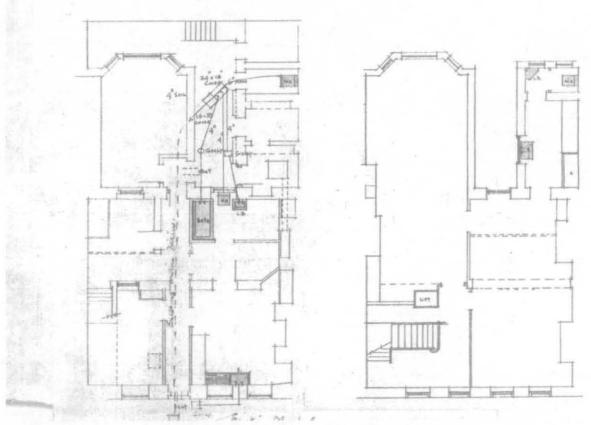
Plans of interior in 1951 (Drainage Plan, RBKC)
